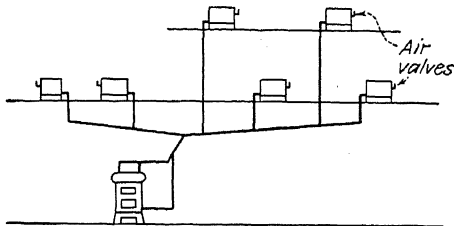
Single-pipe steam system—mains pitching toward boiler.
